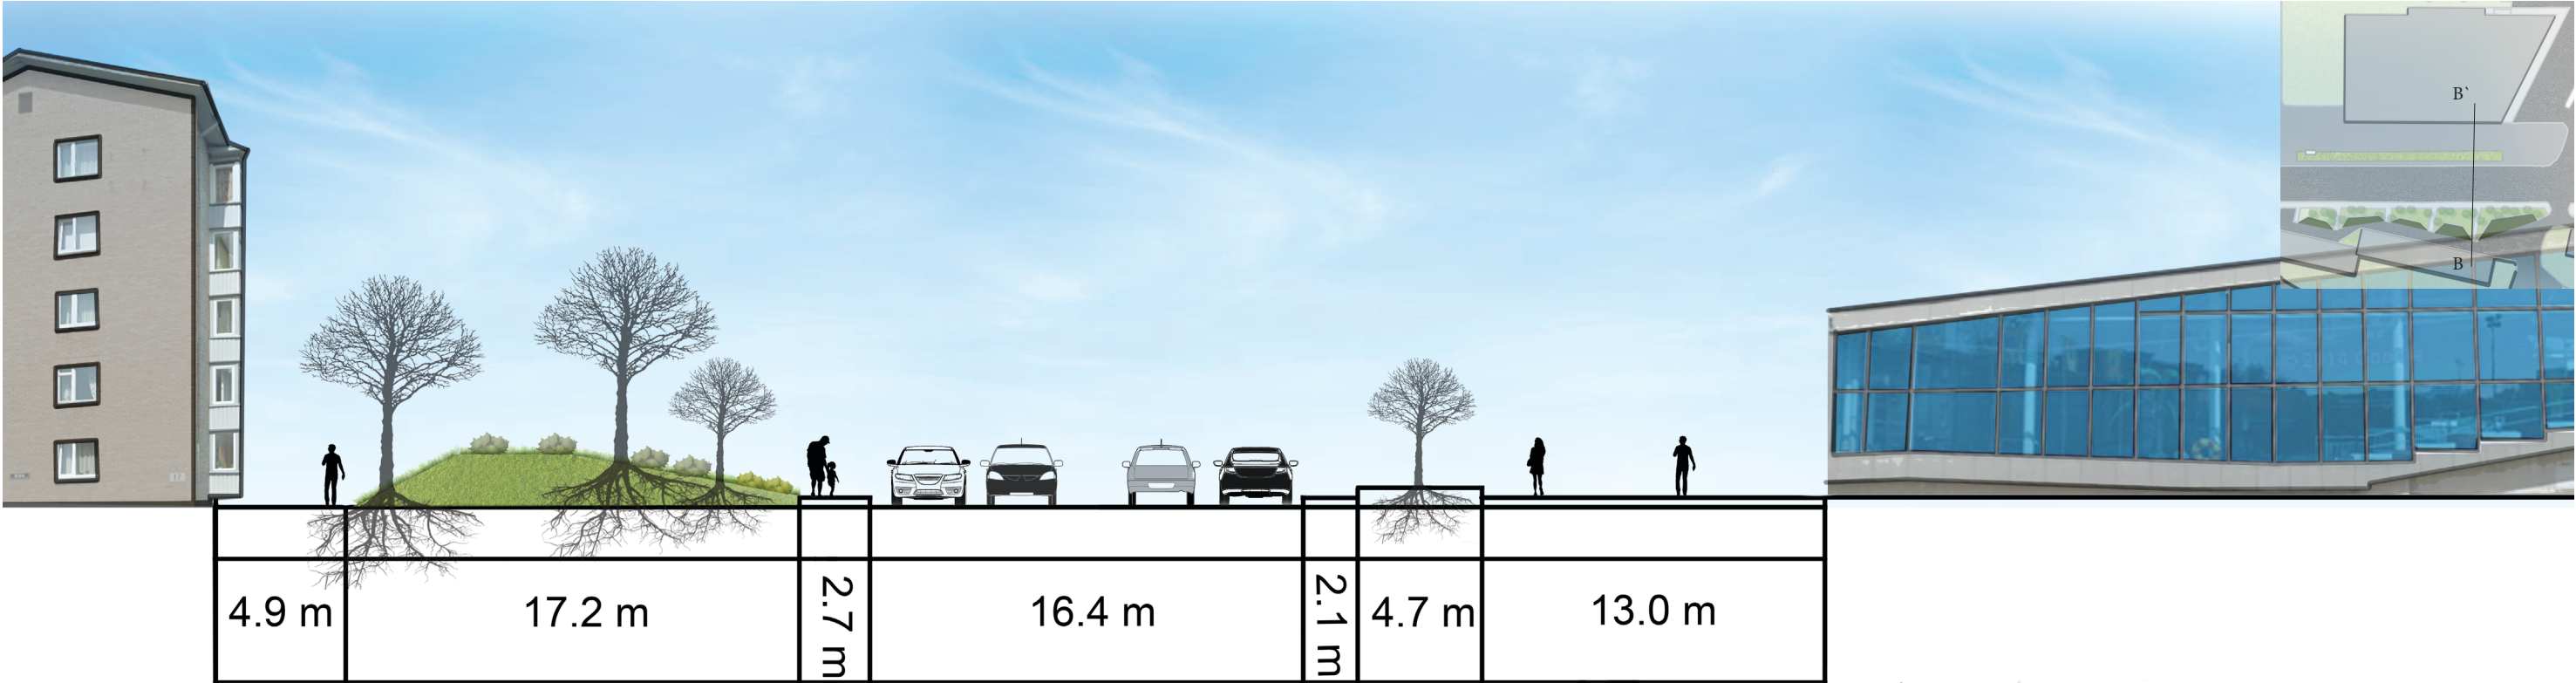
Section between apartment houses and Aura showing raised ground to reduce noise. (Section 1:200)
